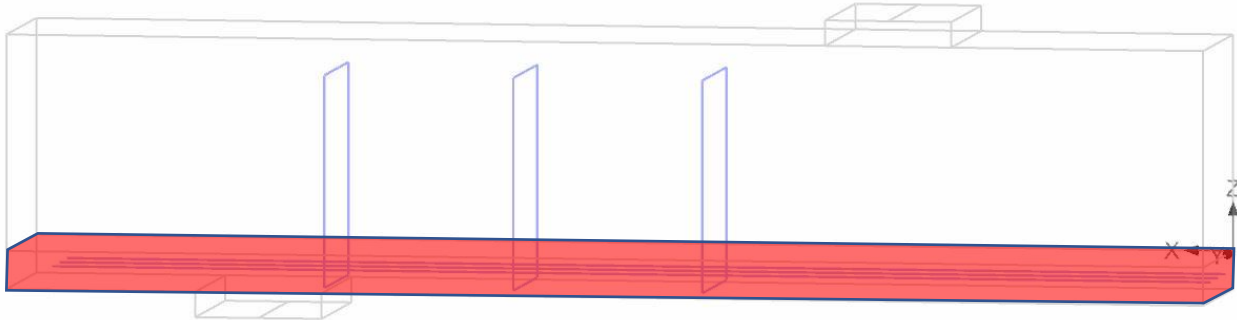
ATENA model of Reinforced Concrete Beam with 31mm SHCC layer in the tension zone (marked in red) and 11mm reinforcement cover.
